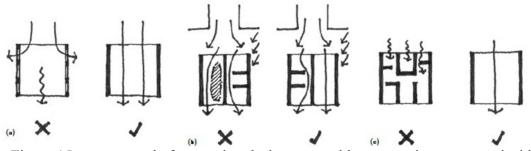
some sample for opening design to provide proper air movement inside buildings. Source: (Chenvidyakarn, 2007)
